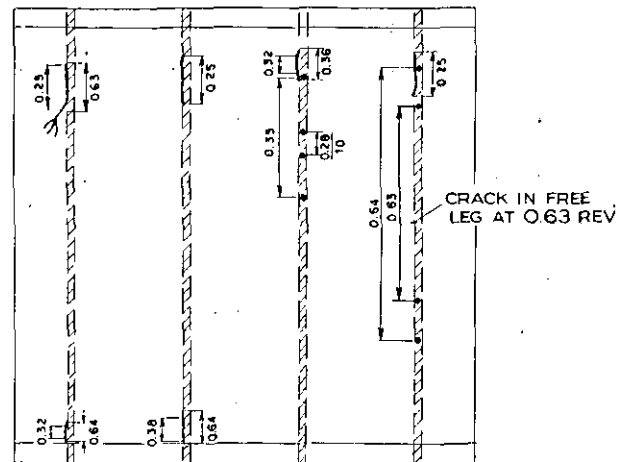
The cracks and peeling of panel Ib-75-1.
